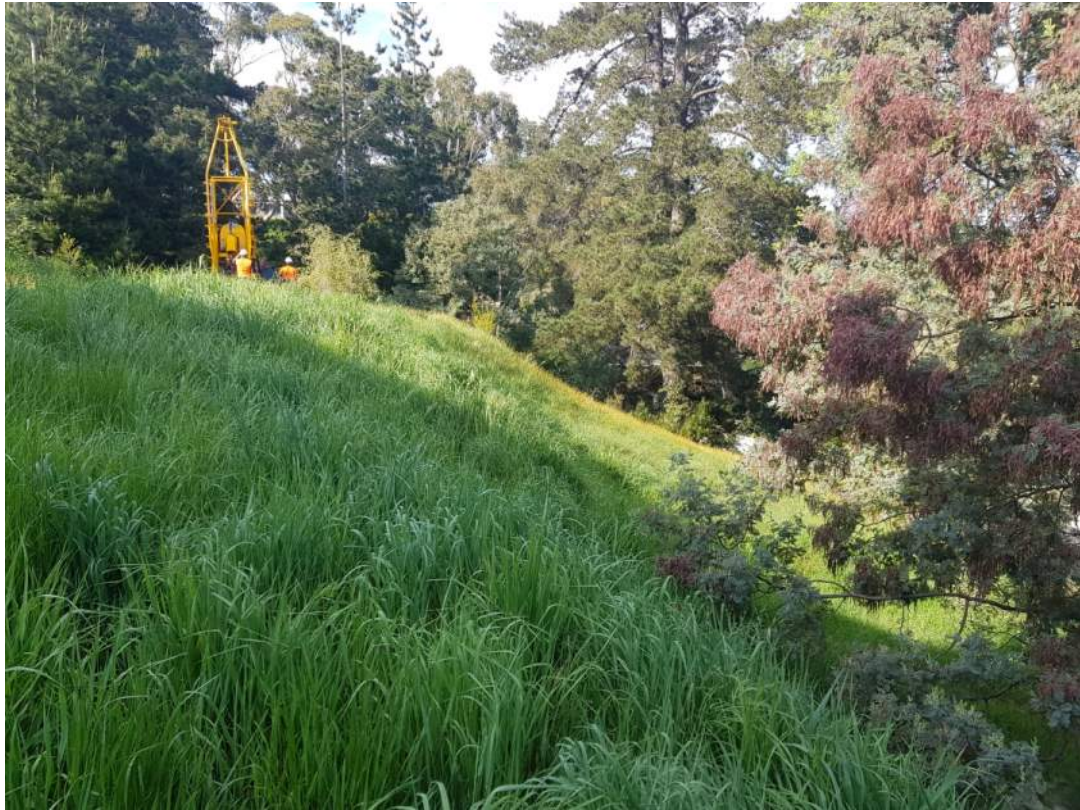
THE STEEP FILL BATTER SLOPES IN THE CENTRAL PORTION OF THE SITE LOOKING TO THE SOUTH
